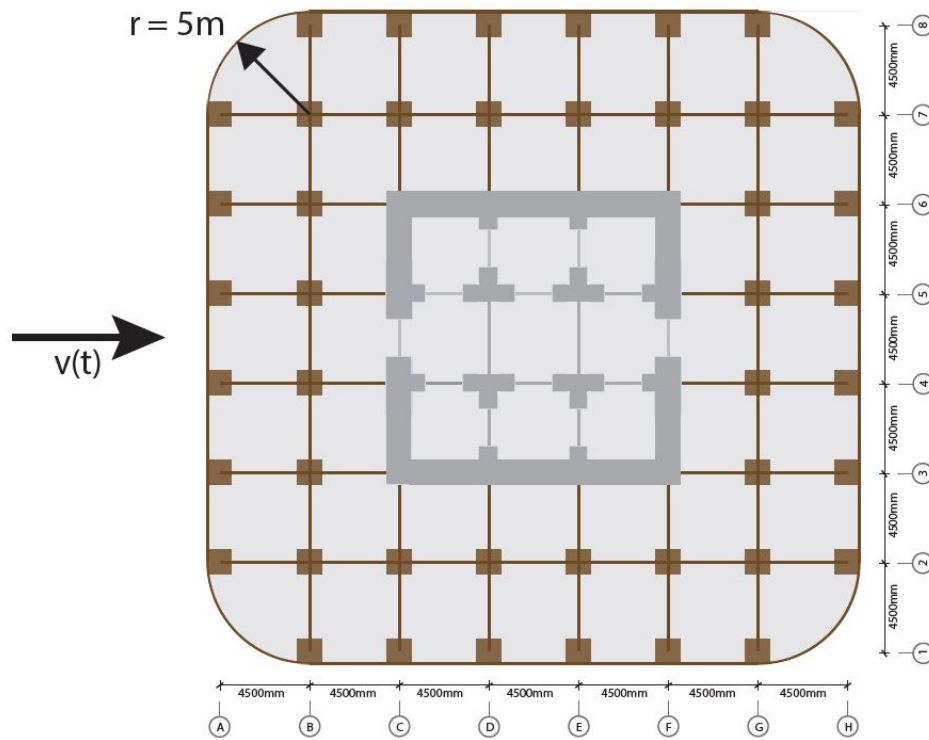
Plan view of tall building with rounded corner modification, $r=5\text{m}$.
